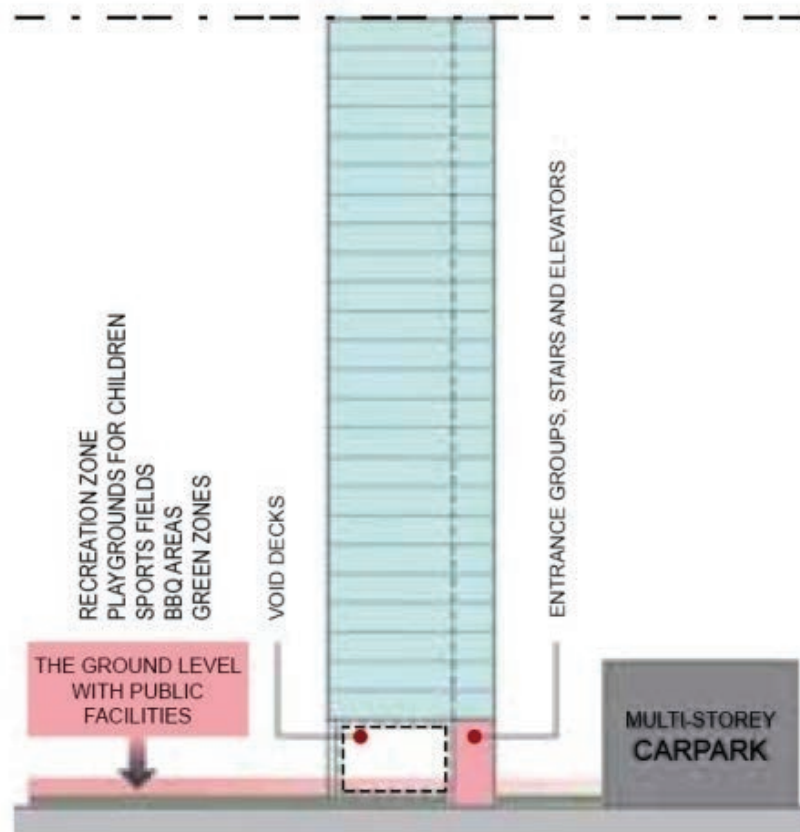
Open ground floor such as void decks in The Pinnacle. (Source: [3-42])
